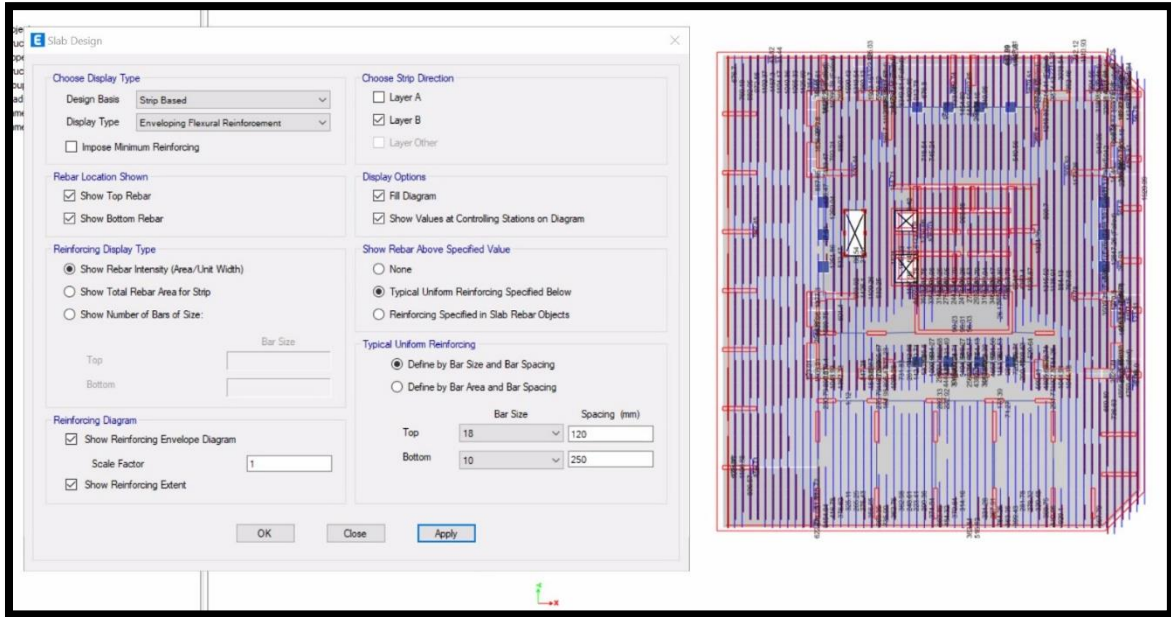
Top Reinforcement in Y-Direction for Ground Floor
